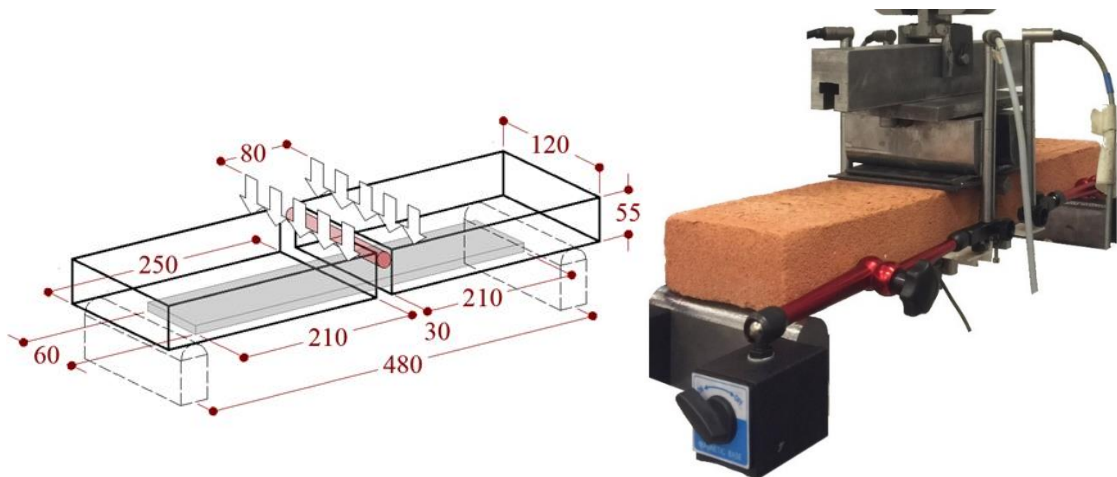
One-bricks modified beam test set-ups geometries and dimensions (mm).
